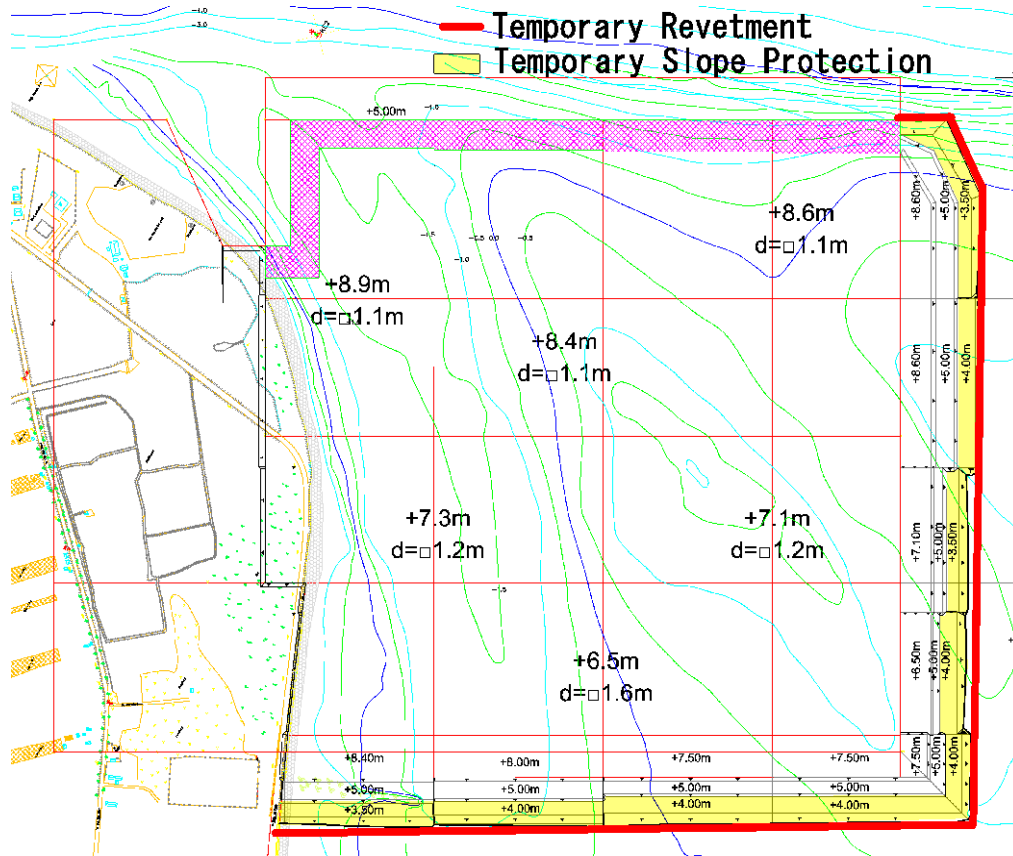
Locations of Temporary Revetment and Temporary Fill Protection
